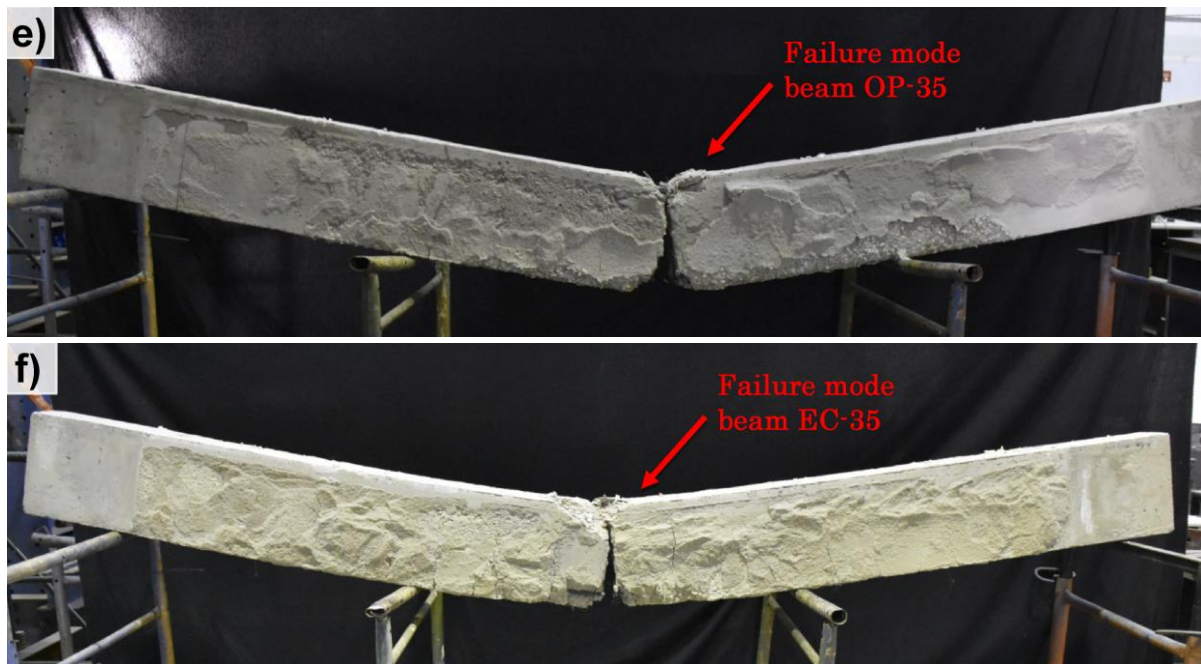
Beams after fire resistance test: (a) CFRP laminate strip collapsed along the heated length; (b) fire protection material detached; (c) cross-section with thermal degradation and cracks; (d) specimen after test in the supports; (e-f) final deformed shape of the specimens (Continuation)
